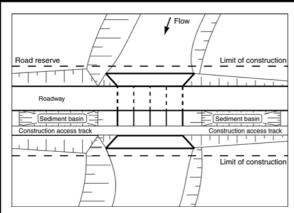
Stage 4: Finish culvert and construct half of the roadway slowly backfilling the *Sediment Basins
